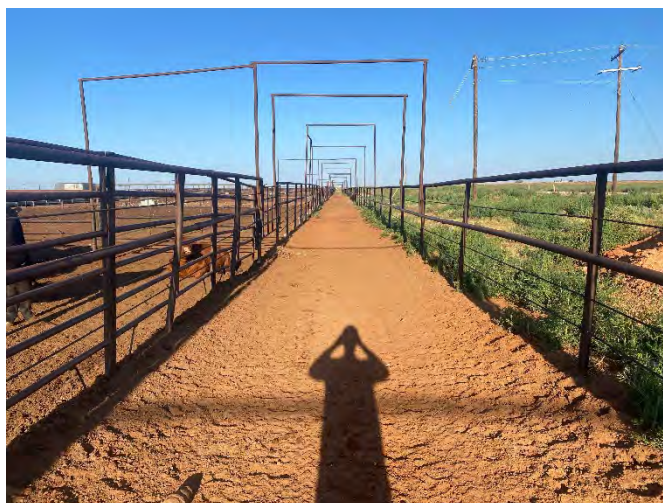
Photo view of release area after further excavation of impacted soils (30Aug23)
